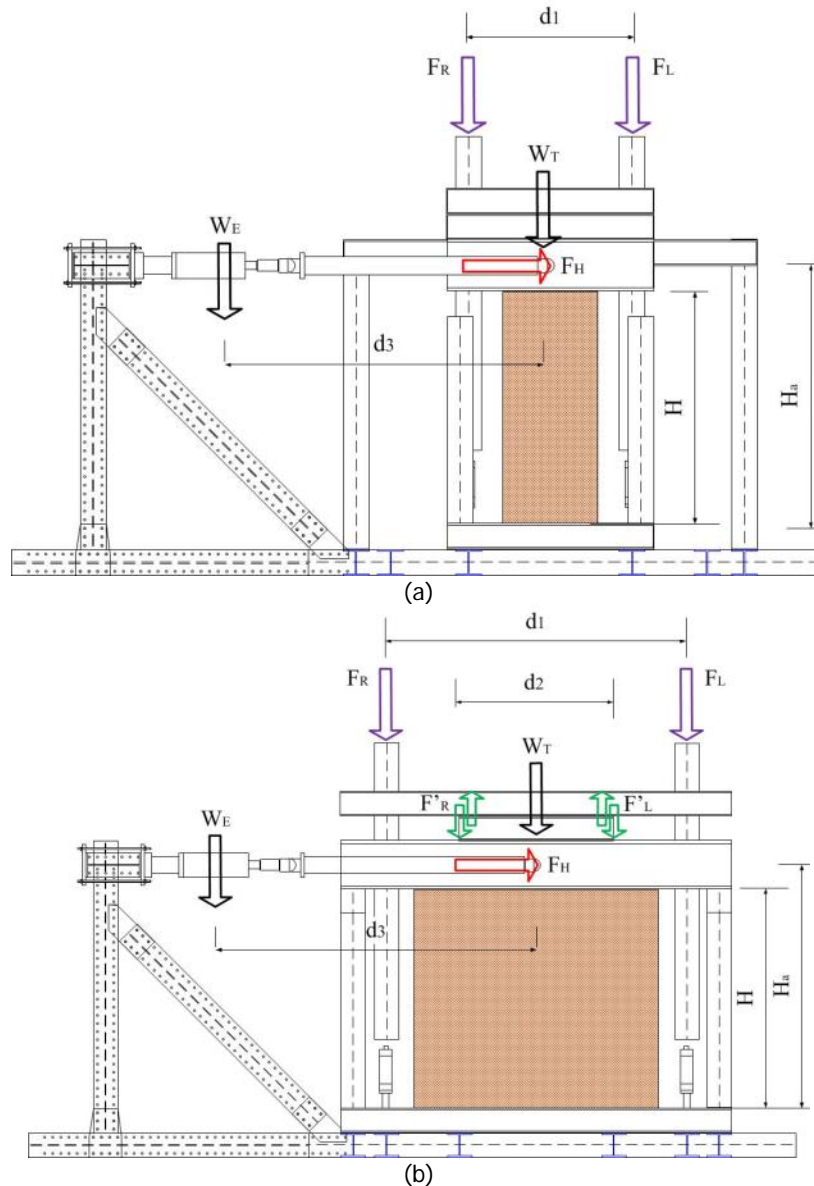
Loading scheme for specimens subject to in-plane test: (a) slender wall; (b) squat wall.
